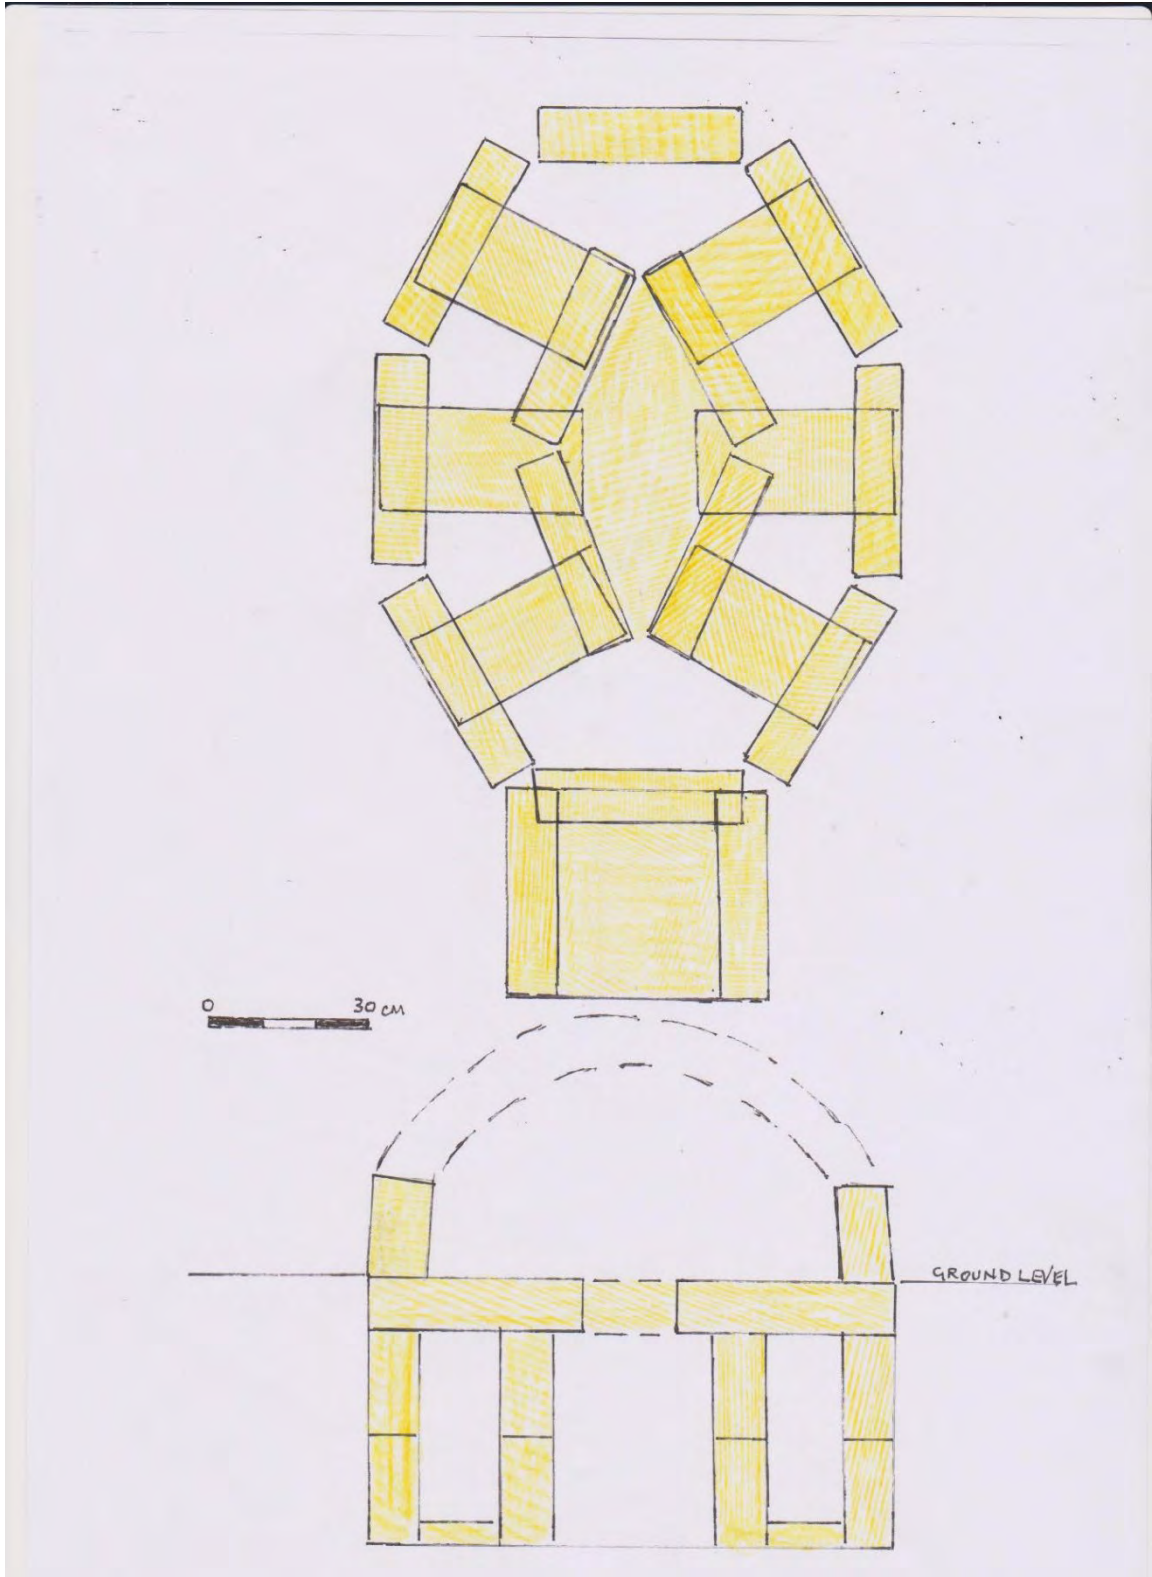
The Stoke Quay Ipswich ware kiln plan and section. (from Brown et al 2020)
